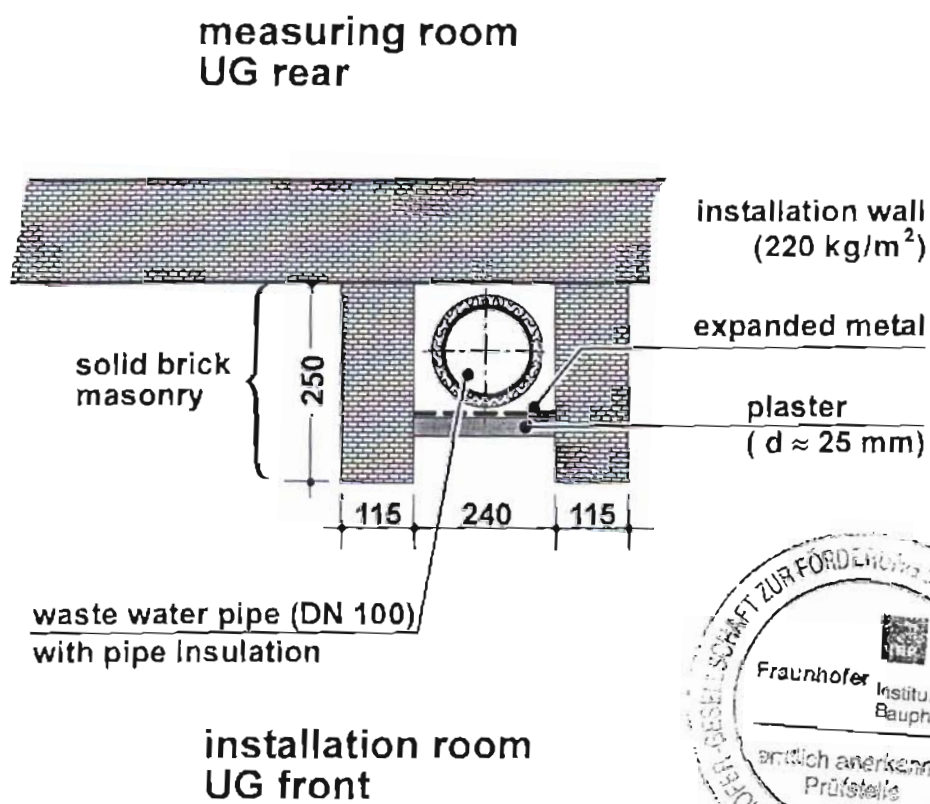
Sectional drawing of the test set-up (horizontal section of the installation duct in the UG front of the installation test facility, drawing not to scale, dimensions in mm).
